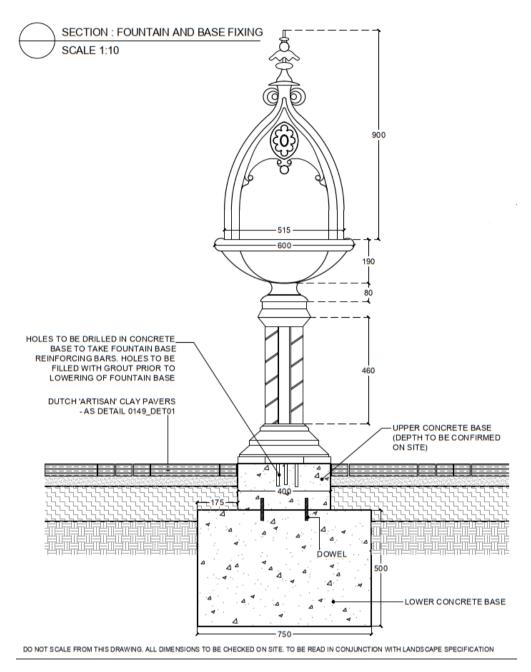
Cross section of Drinking Fountain on new concrete plinth at St Pancras New Church
